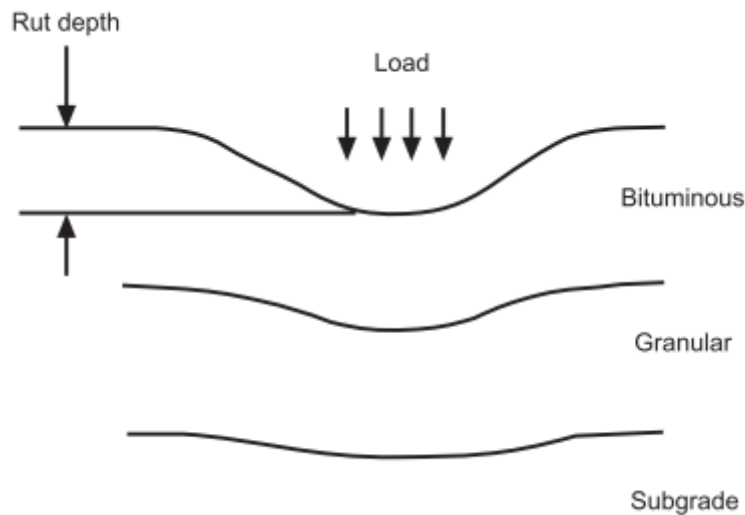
Rutting throughout the layerworks of a pavement (Brown, 1996)
